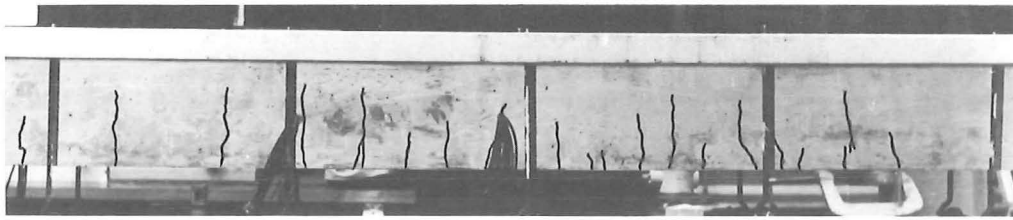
CRACK DISTRIBUTION IN BEAM ONE (SHRINKAGE CRACKS)
